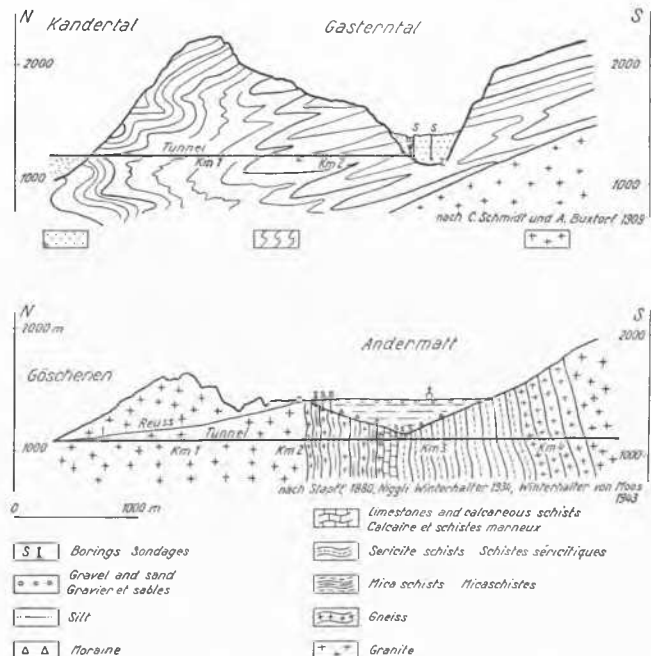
Schematic Cross Section Through the North Section of the Loetschberg Tunnel (above) and the St. Gotthard Tunnel (below)
